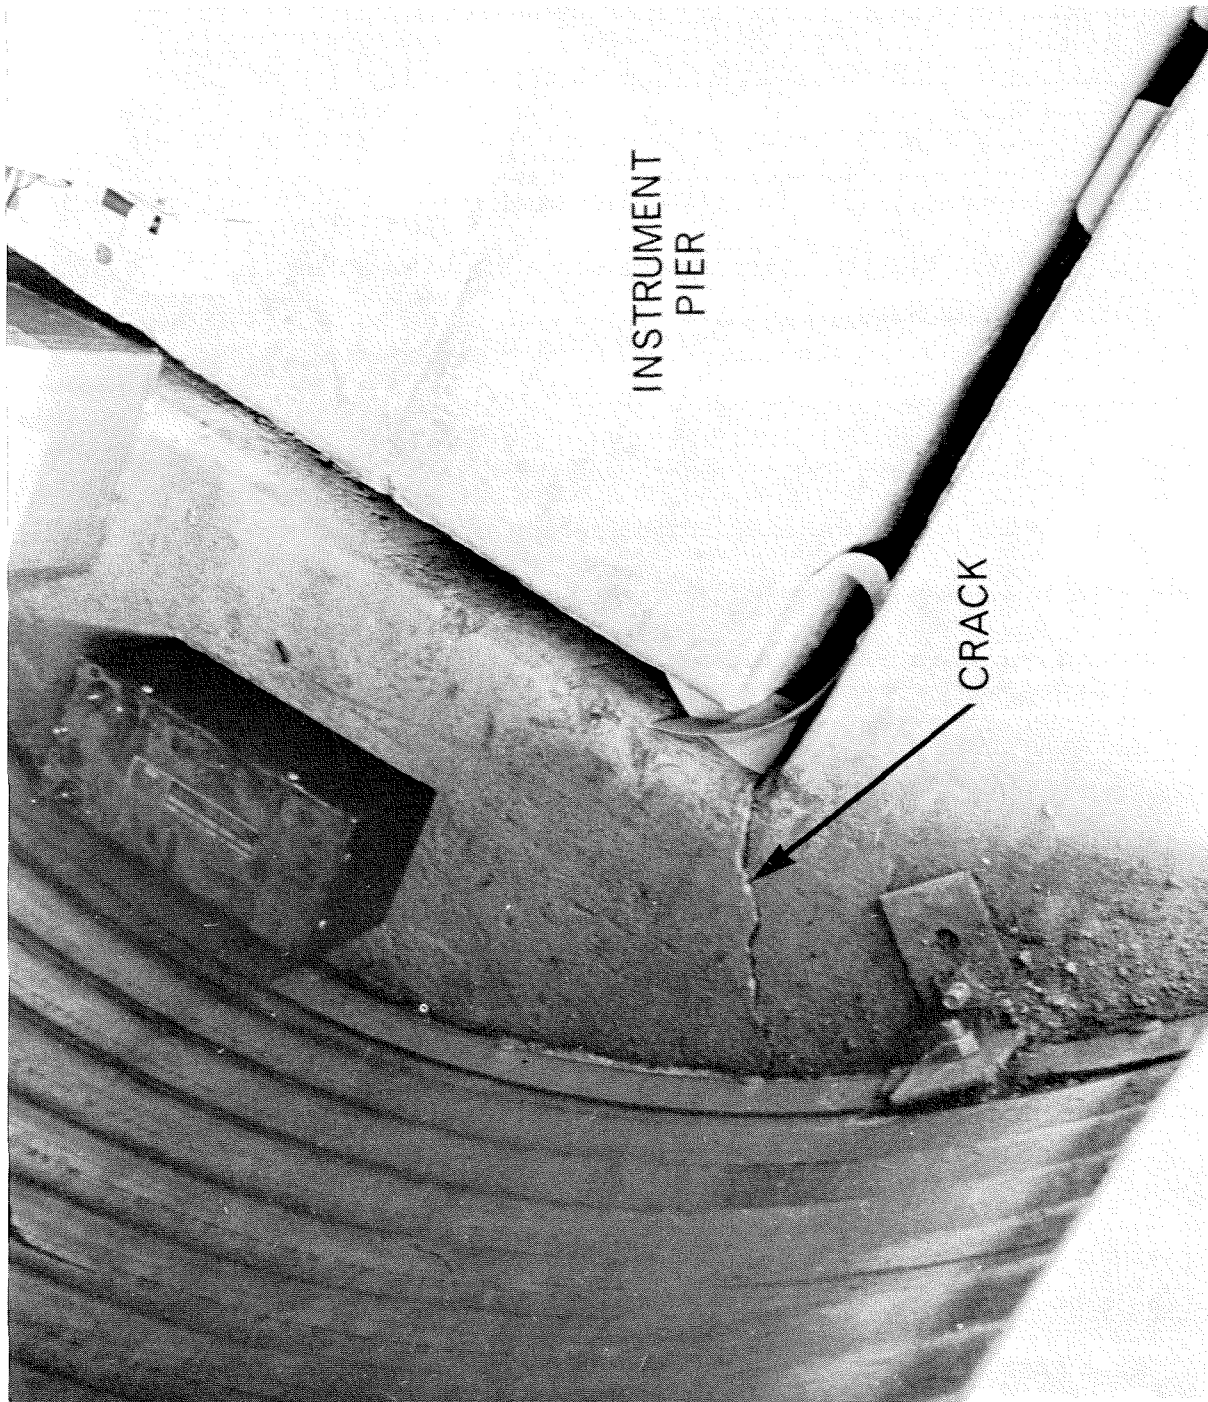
Cracks in the foundation of the instrument house.
